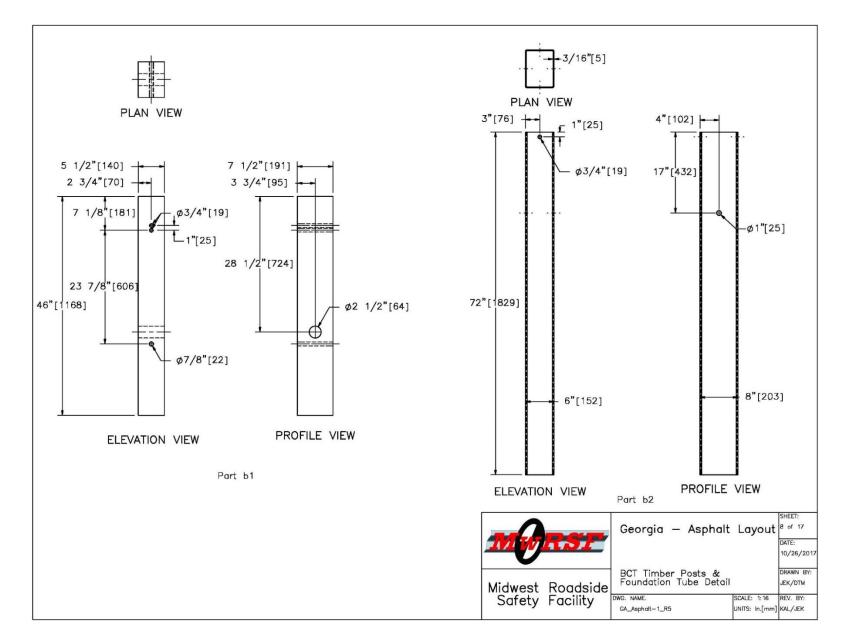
BCT Timber Posts and Foundation Tube Details, Test No. GAA-1
